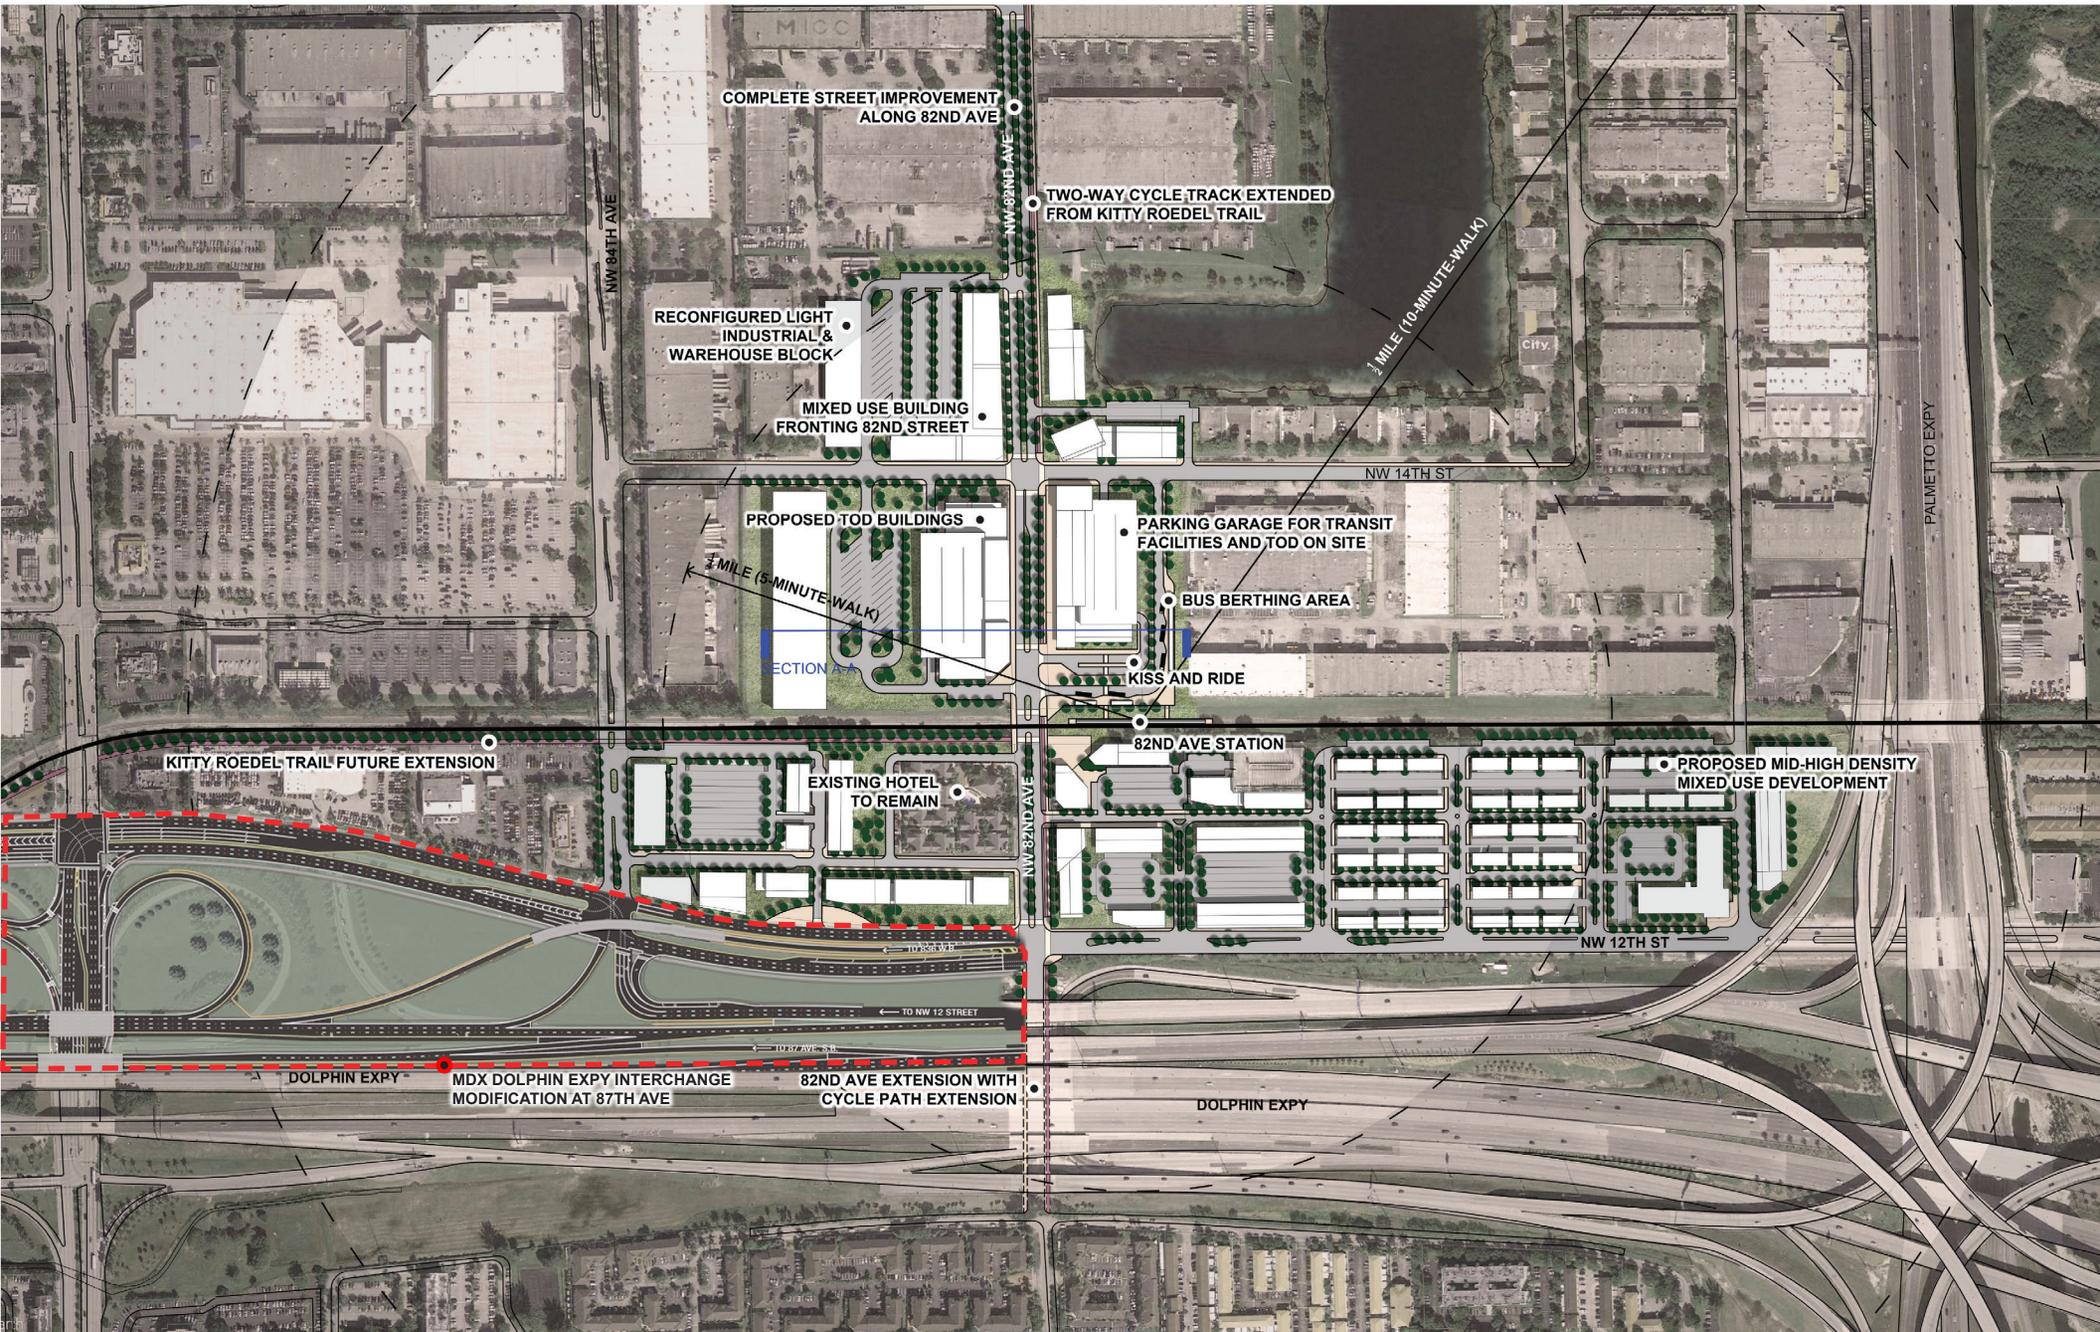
NW 82nd Avenue Station TOD Concept Layout
